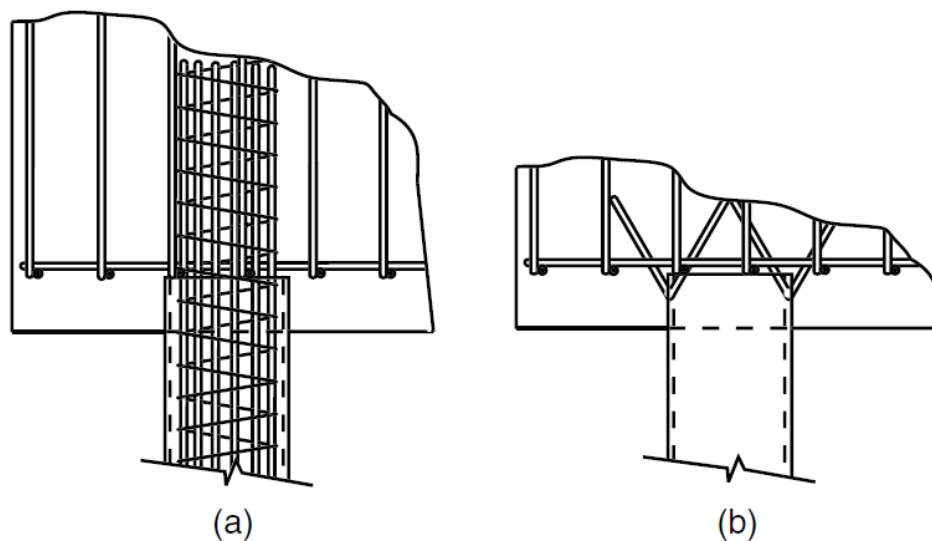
Example of Detail for (a) Fixed Pile Connection, and (b) Pinned Pile Connection (Richards, Rollins et al. 2011)
